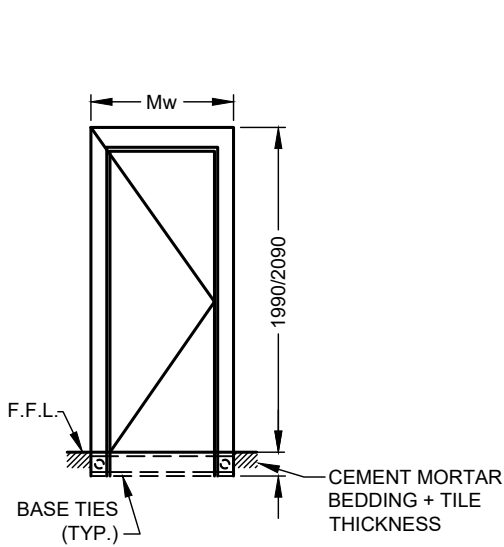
A STANDARD DOOR FRAME — SINGLE LEAF
